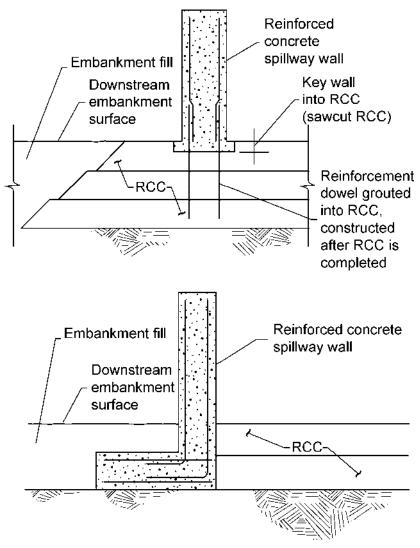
Reinforced concrete training wall (section looking downstream) (PCA, 2002, all rights reserved).
